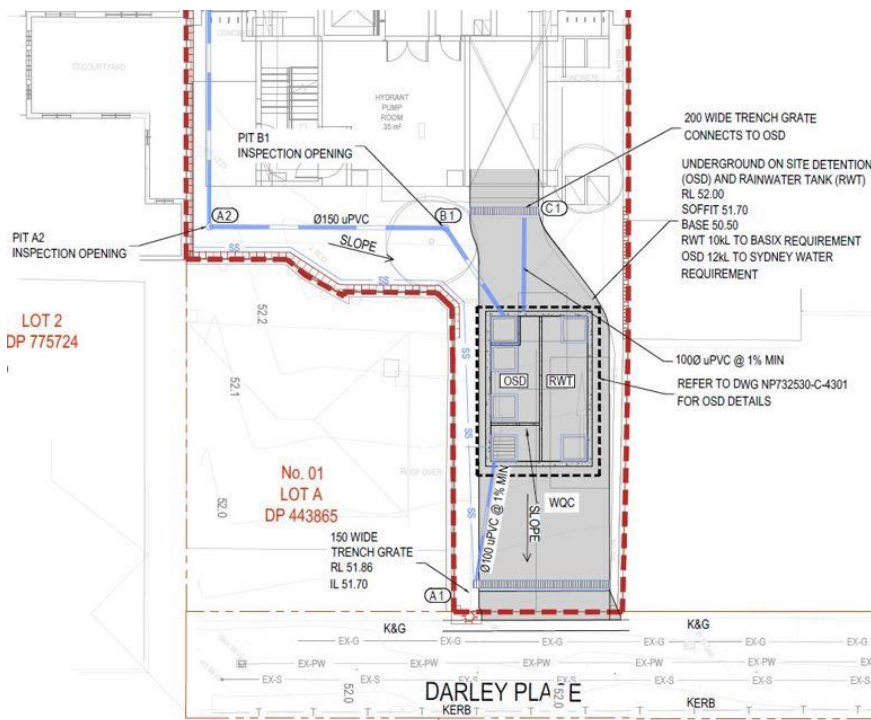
Stormwater management plan drawing extract, showing the proposed stormwater pipe (depicted in blue) running through the deep soil area at the rear of the site
